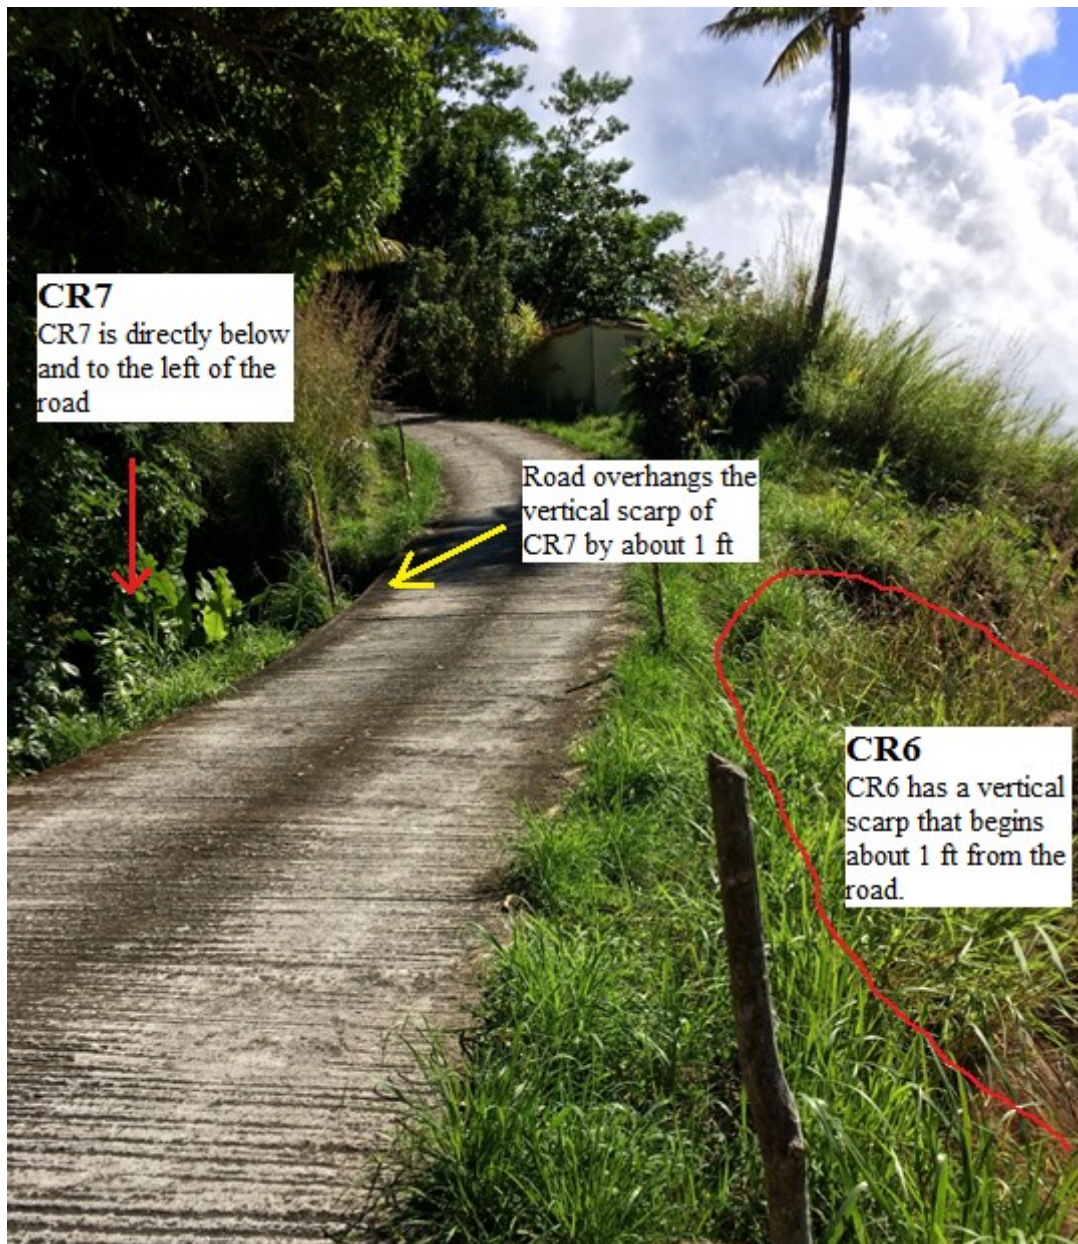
Portion of Cochrane Road that is on a narrow ridge with slope failures on either side. CR6 is located on the right side of the road and begins about 1 ft from the road. CR7 is located on the left side of the road. A portion of the road overhangs CR7's scarp by about 1 ft.
